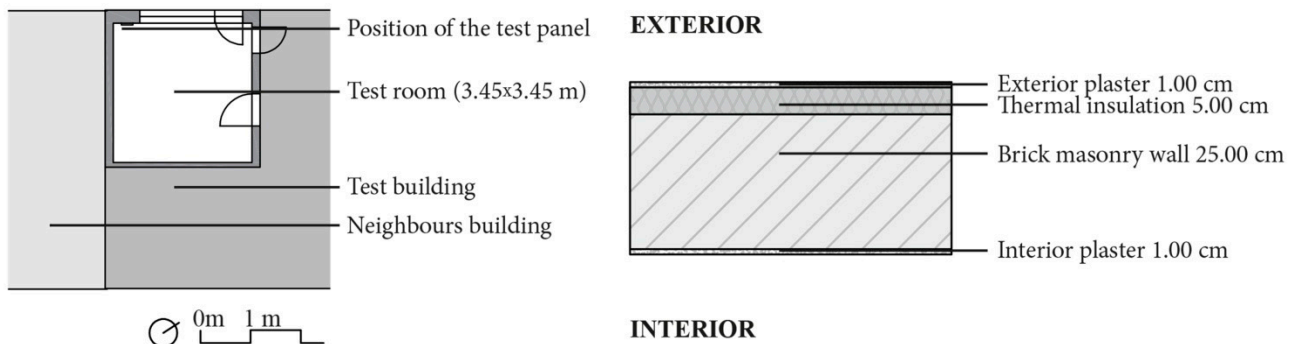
(Left): Ground plan of the test room. (Right): Exterior wall of the testing room.
